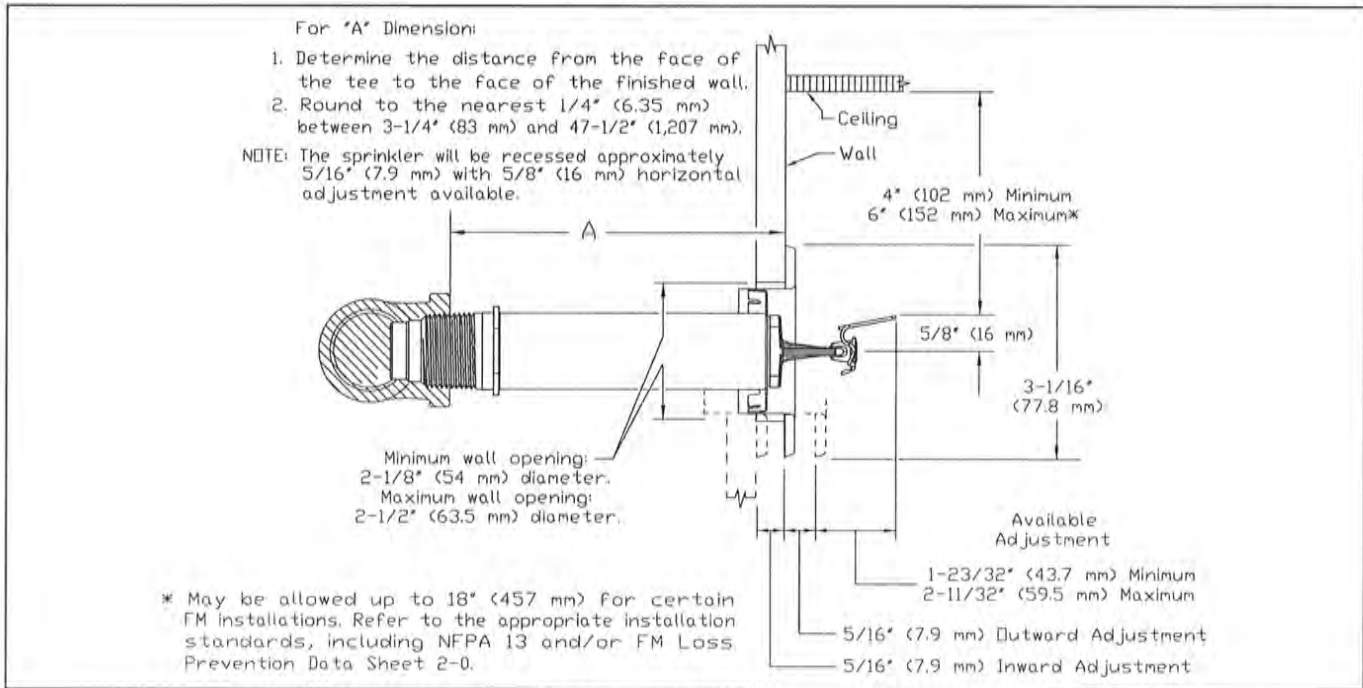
Adjustable Recessed Dry Horizontal Sidewall Sprinkler with the Model E-1 Escutcheon
